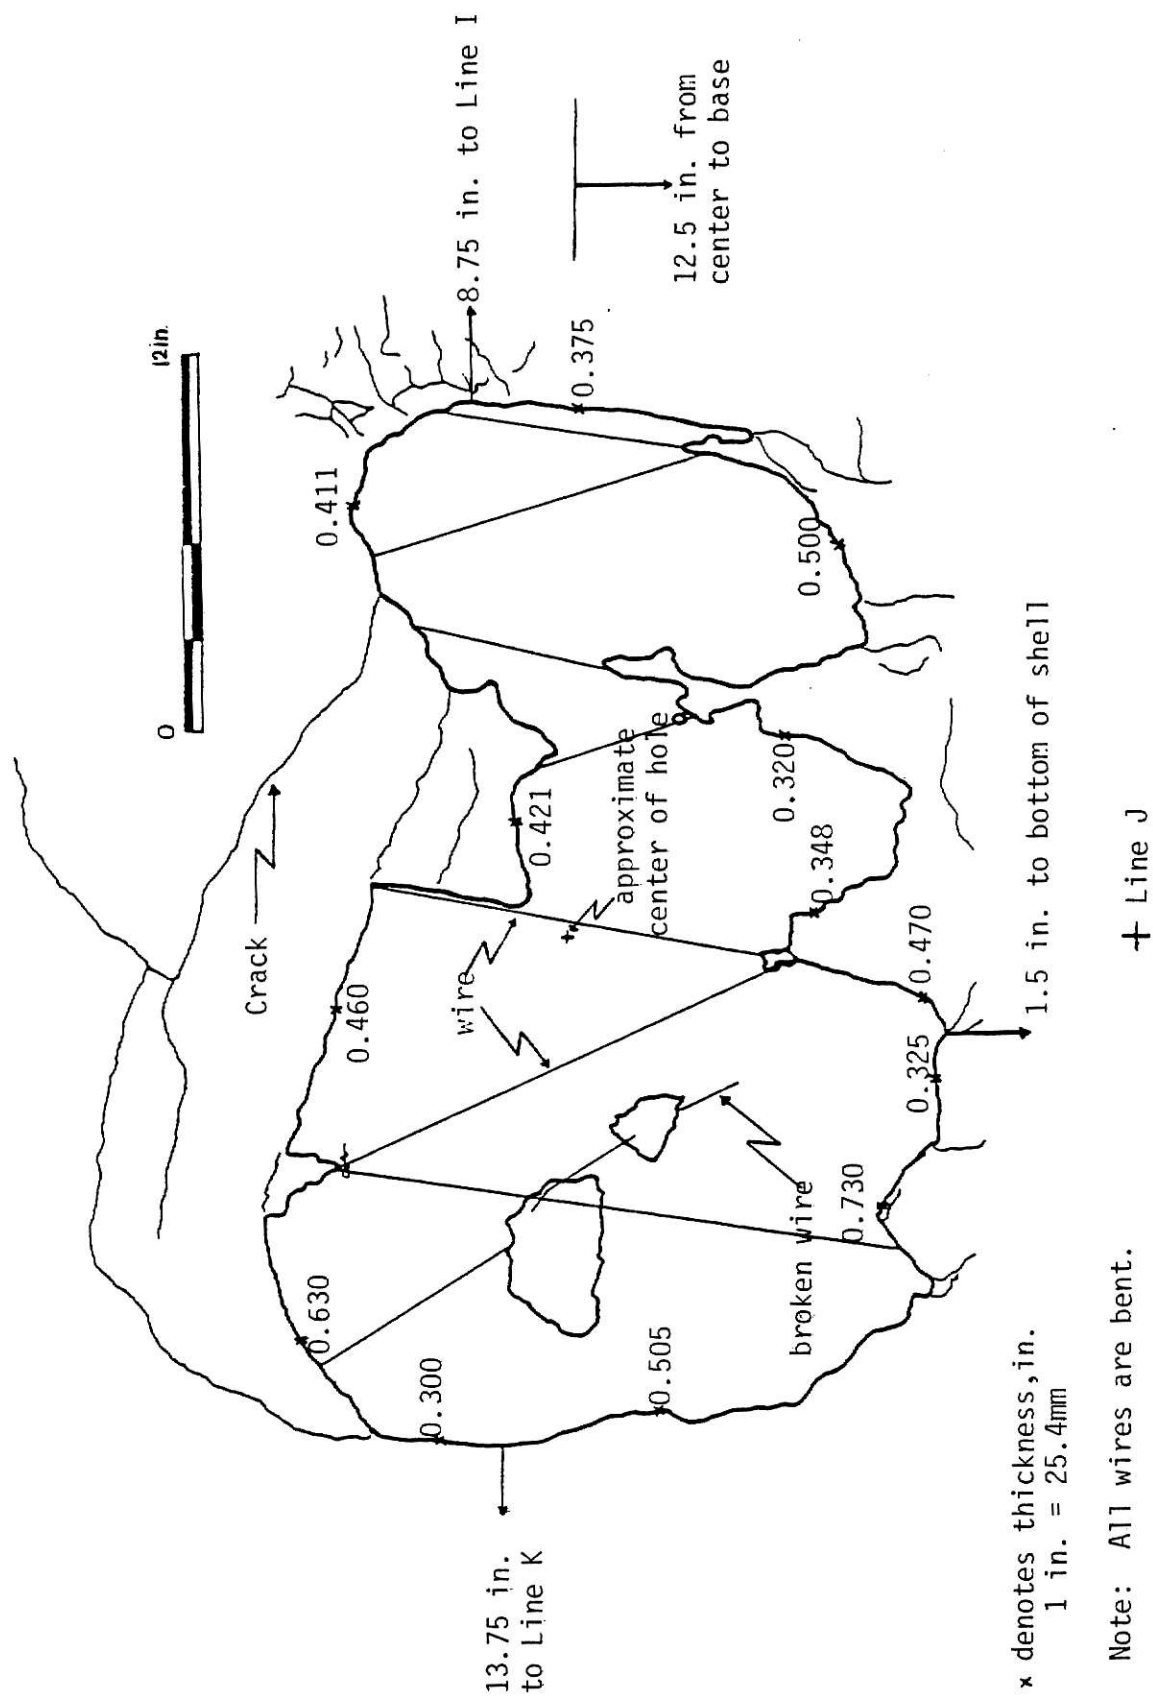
Outside View of Hole, Shell No. 1, Test No. 2, 1 in. = 25.4mm
